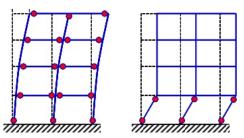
Beam failure and column failure in 2-D frame respectively.
